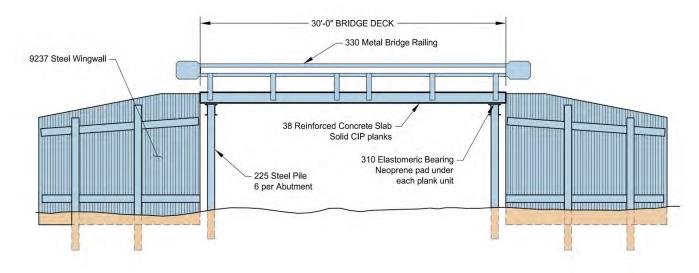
EI.24.2-1: Elevation view of simple concrete slab bridge
